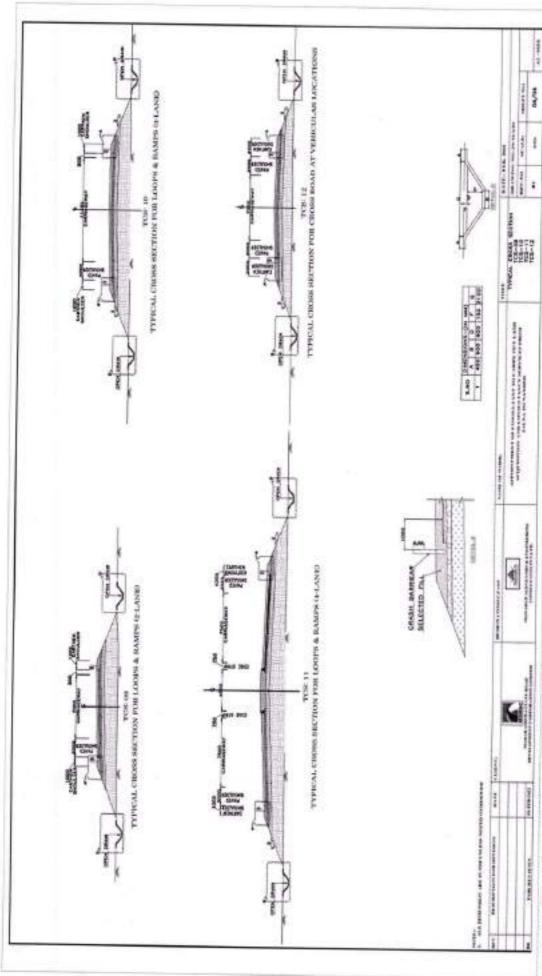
F: (Typ.) Cross Section of Proposed Alignment
